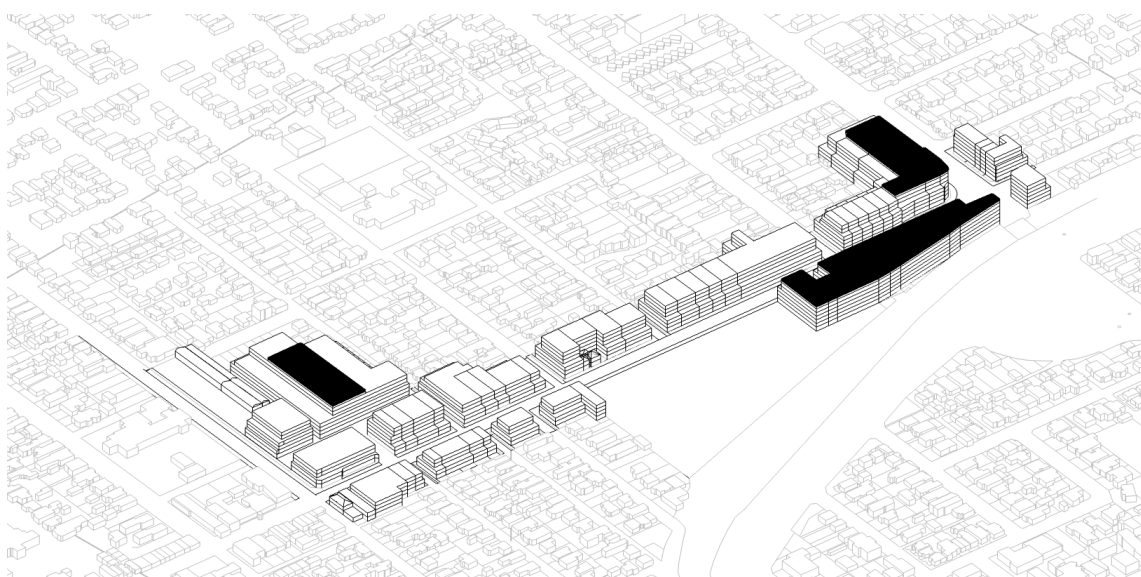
Horizontal section of the 3D model – used to calculate floor-wise area
